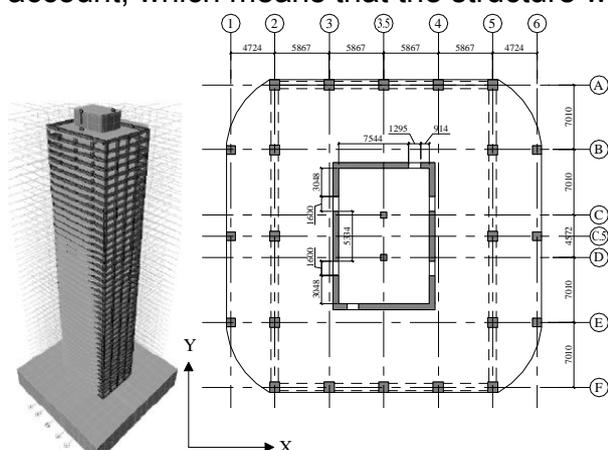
Three-dimensional view and typical floor plan of Building 2A (mm)
